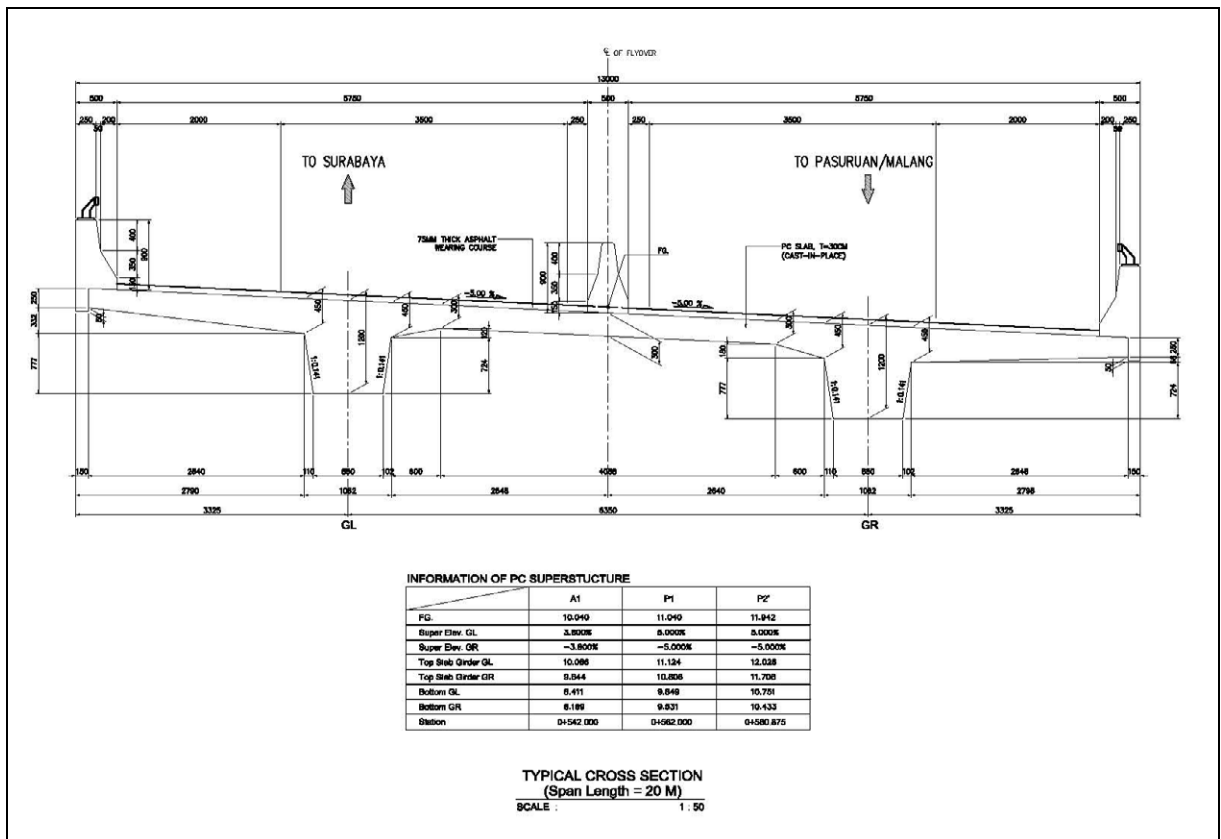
TYPICAL CROSS SECTION OF PC BRIDGE
